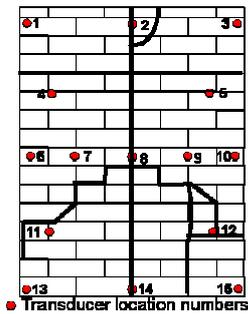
(d). Crack pattern and deflection at centre for hollow block wall (2.6m x 3m) supported on all 4 sides
